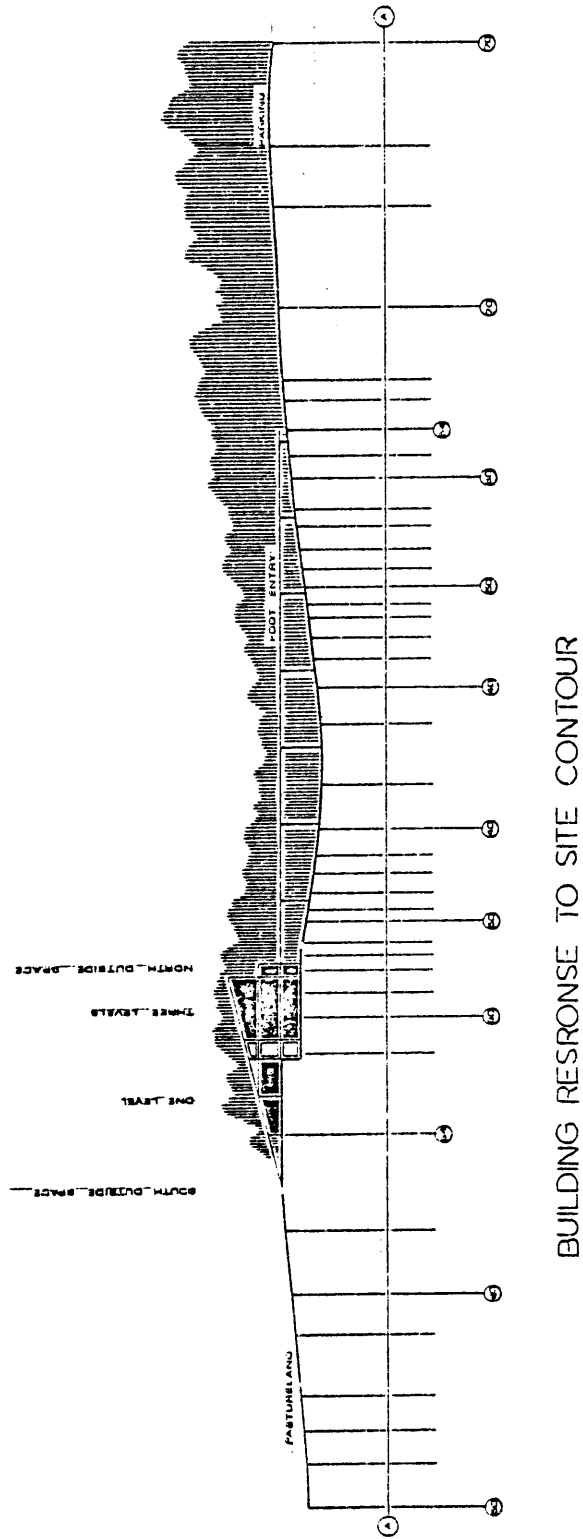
Preliminary Section Two, Building Response to Site Contour
